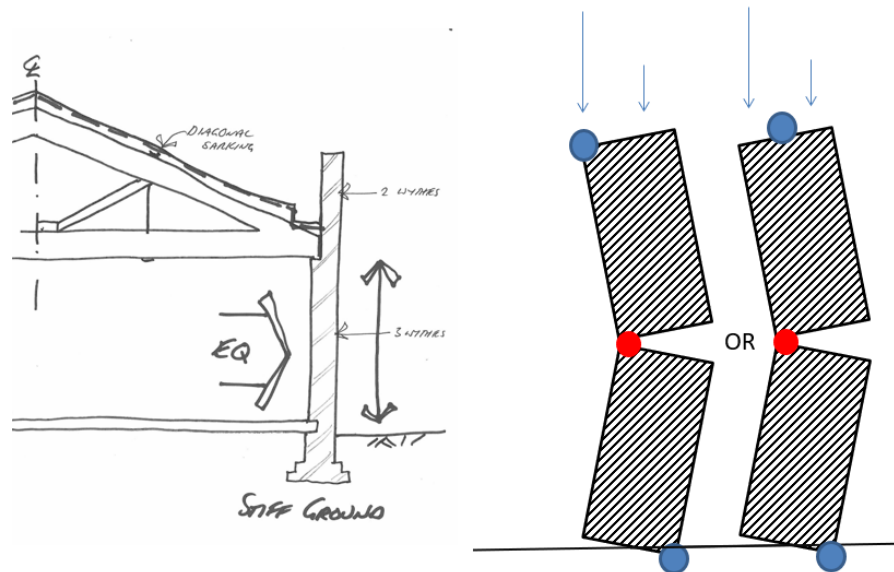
B.32: Boundary conditions for single storey wall with unsecured parapet above
